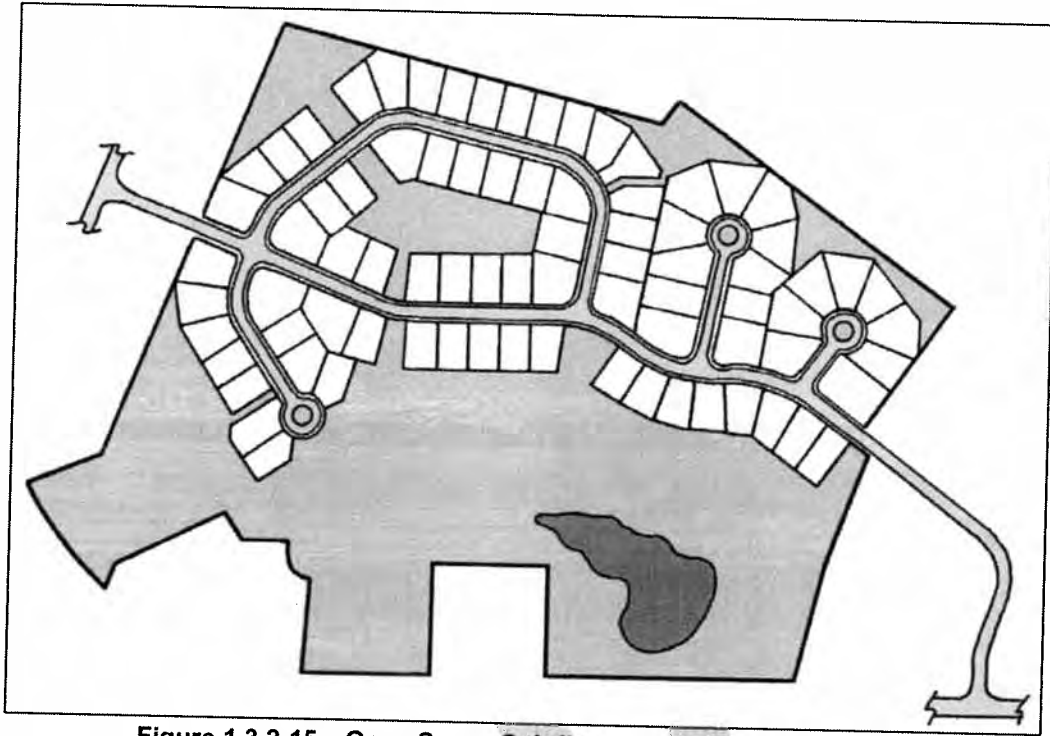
Open Space Subdivision Site Design Example
